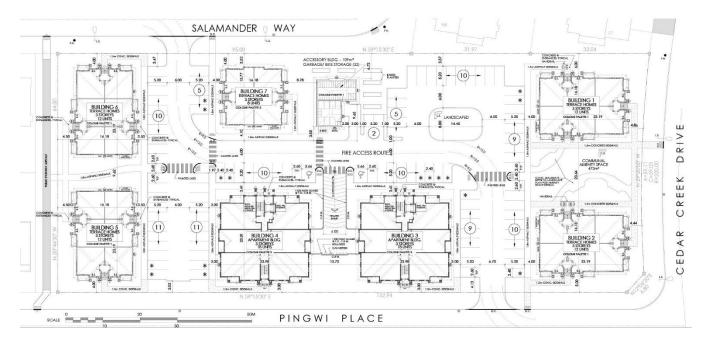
Approved Site Plan, 2020 (D07-12-20-003).
